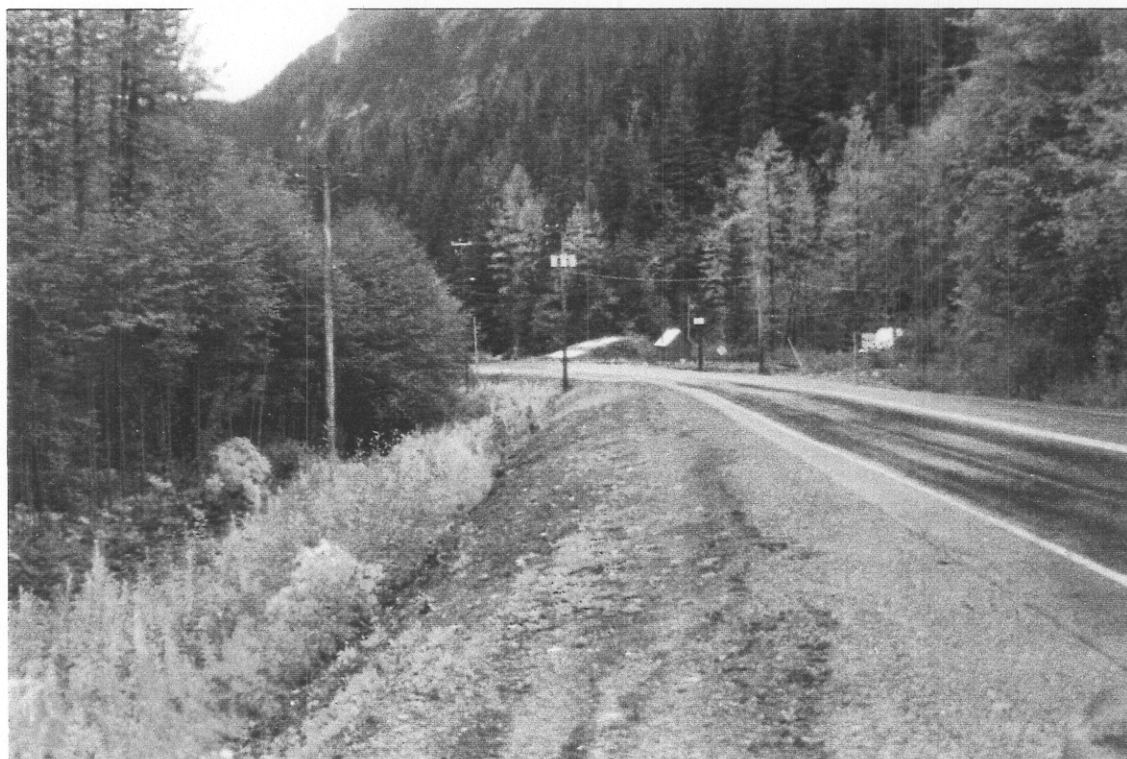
HIGHWAY 37A - WEST BRIDGE APPROACH WITH CUTOFF DYKE INTERSECTION NEAR SPEED SIGN.
